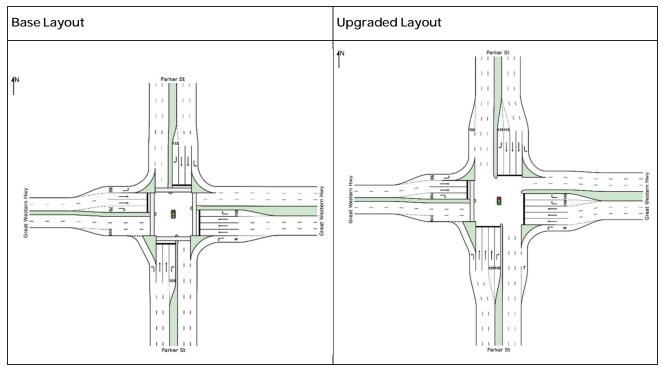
2026 with Links Road extension - Great Western Highway/Parker Street
